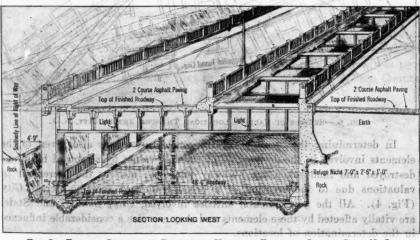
Typical Section of Depressed Highway Through Jersey City, N. J.
